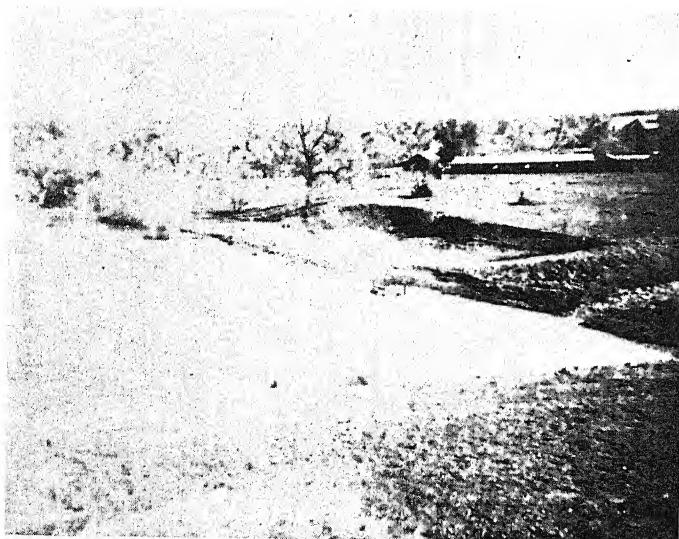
1/27/69 10:32 a.m. Spillway stopped flowing.
